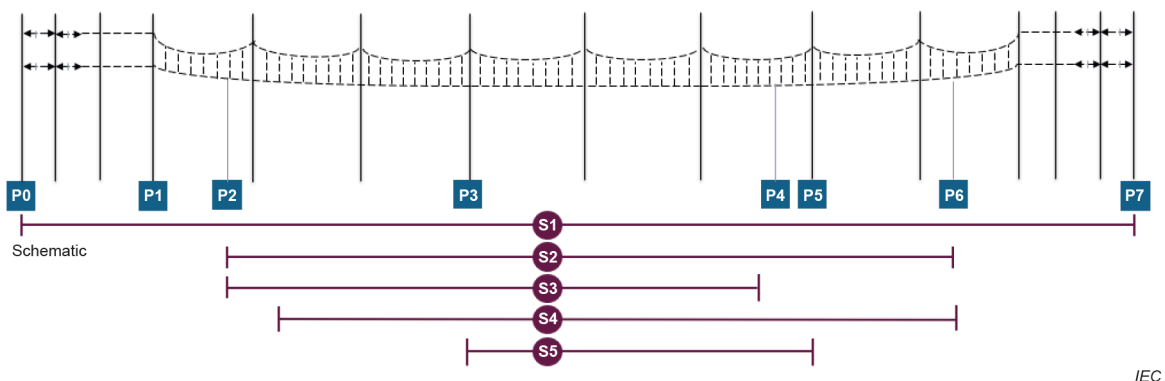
Overlap span (plan view, exemplary design for anchoring, representation without electrical connections)
